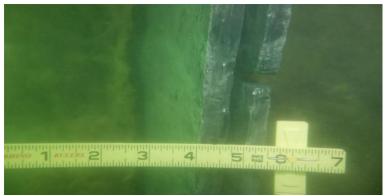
Deterioration at Pile Splice (Courtesy of Childs Report)
